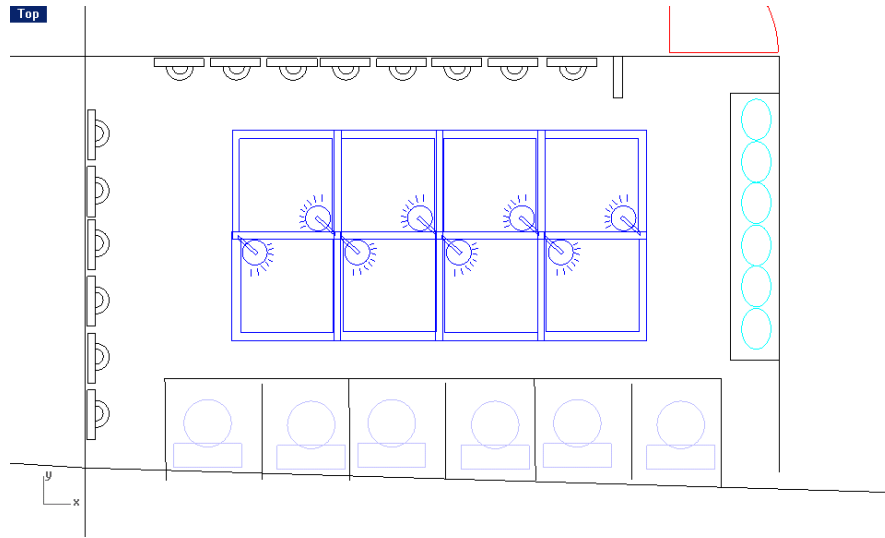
Living Arrangements – Typical Crew Sanitary Space
